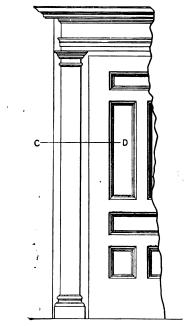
Partial Elevation Showing "Grounds" Under Pilaster Next to Plastered Wall.
